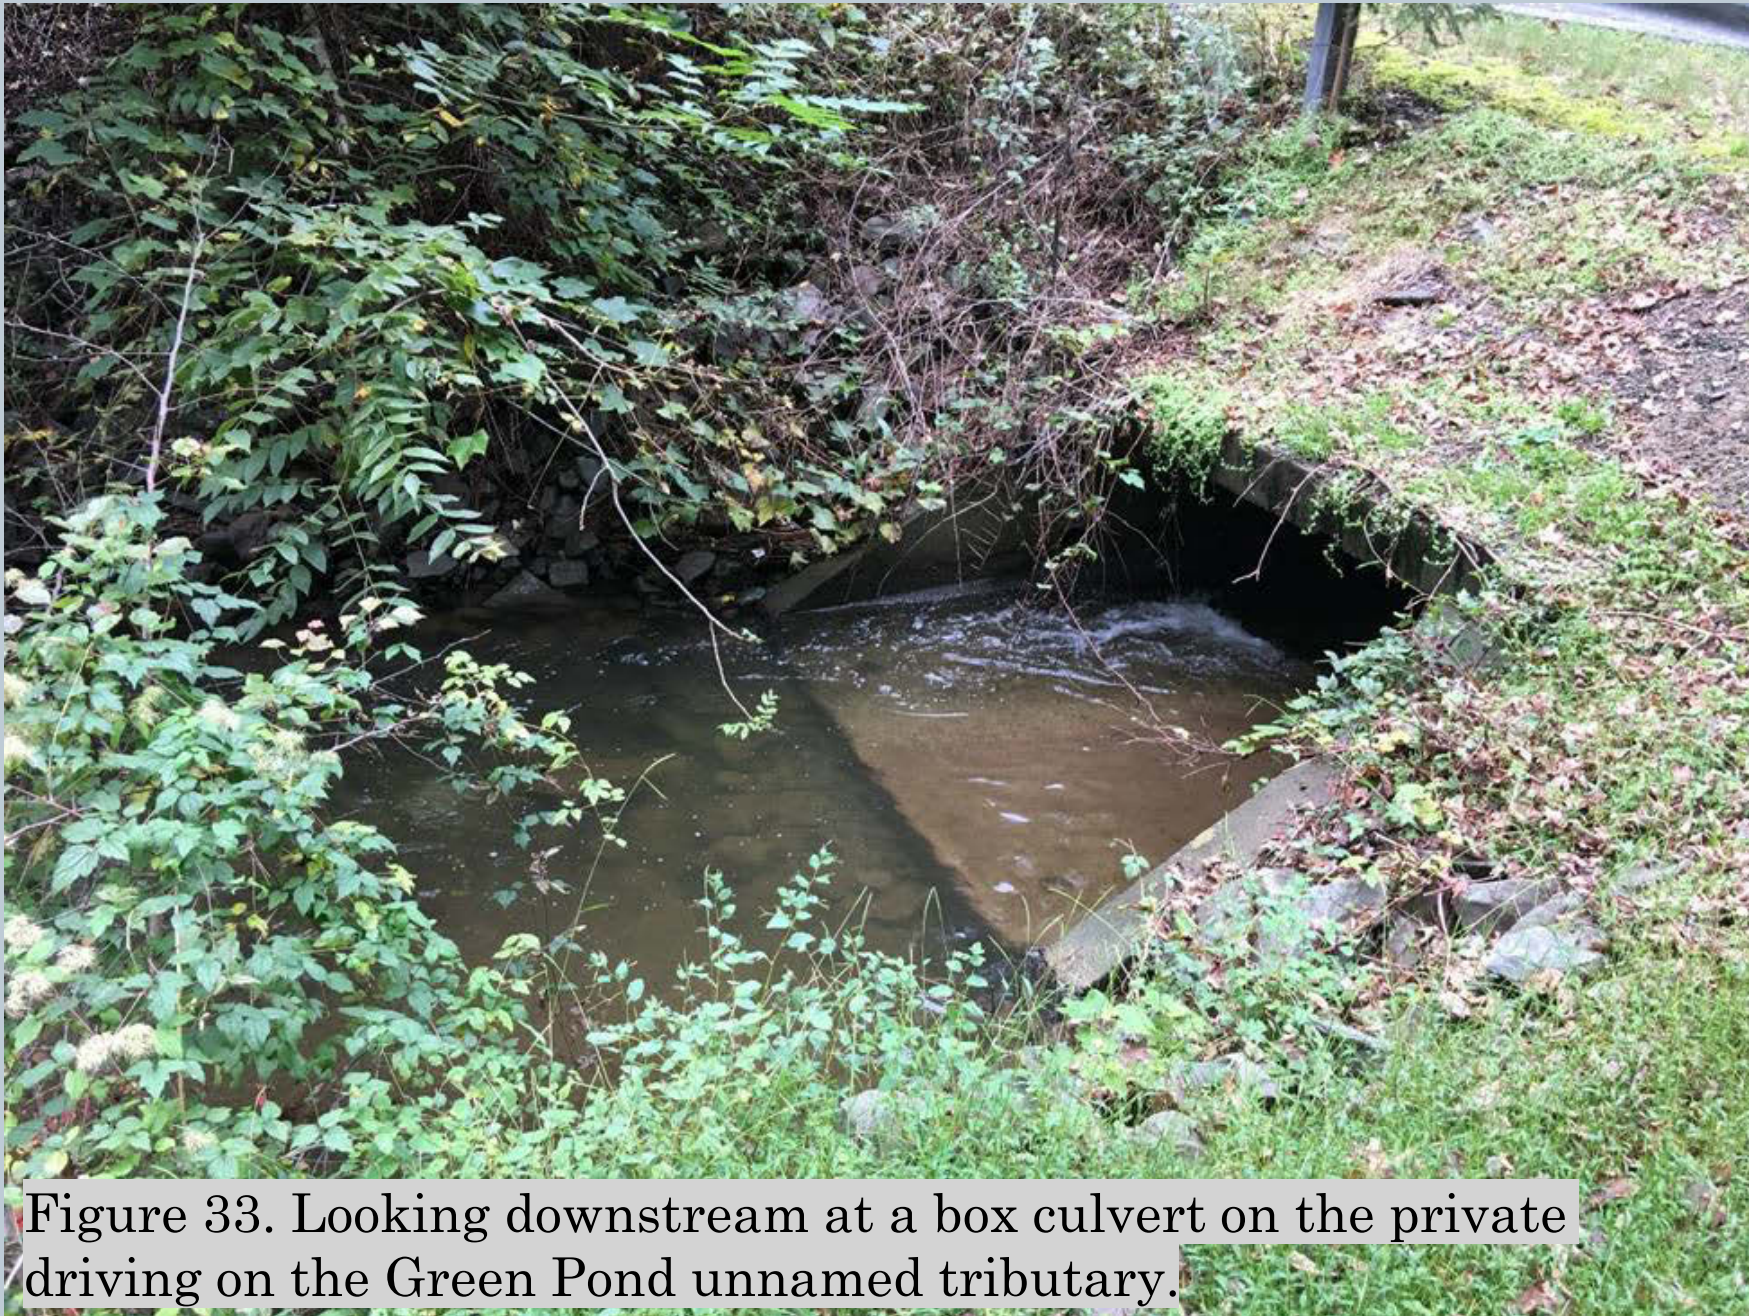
Looking downstream at a box culvert on the private driving on the Green Pond unnamed tributary.
